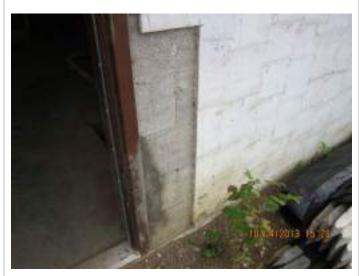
Parging has been removed on the oustside wall near the door to the Dry Well.
